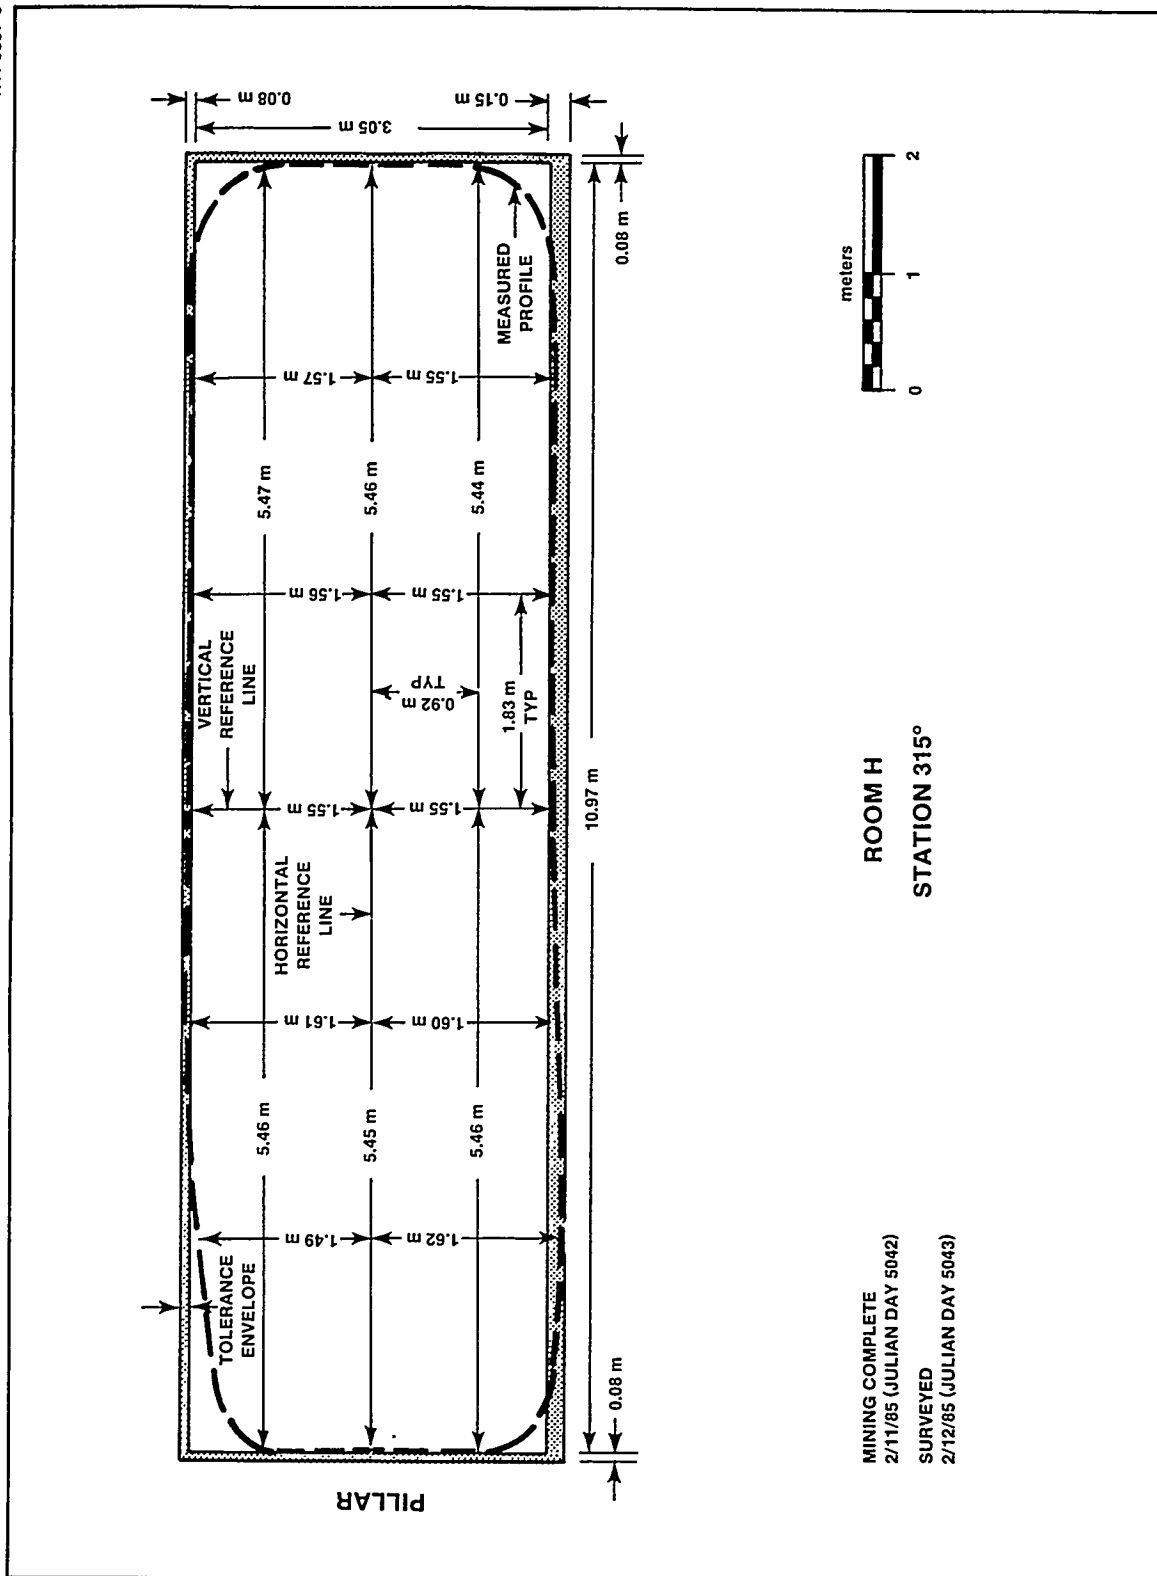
As-Built Cross Section of Station 315°, Room H
